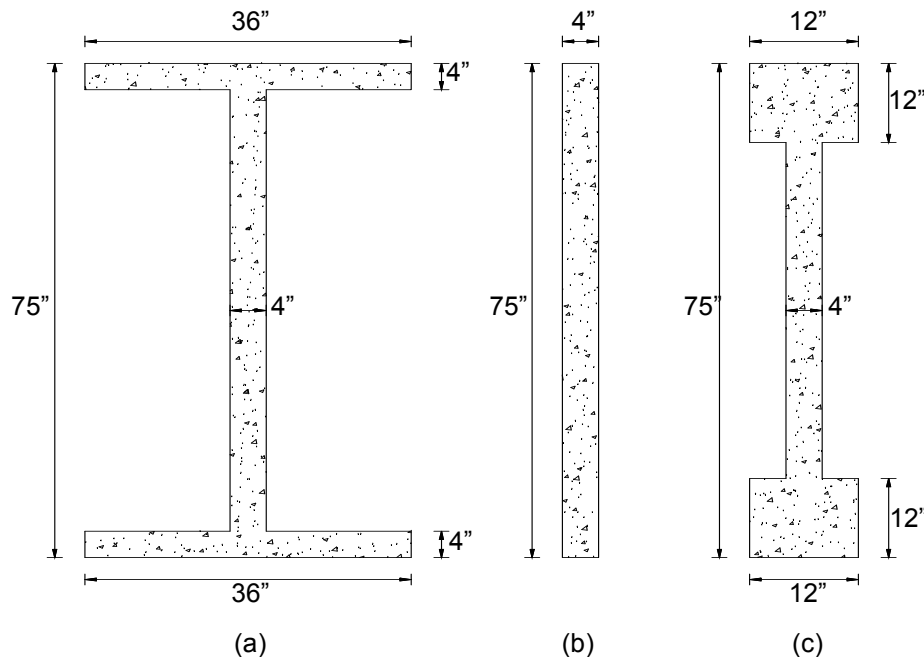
Nominal cross-sectional dimensions of test specimens (1 in. = 25.4 mm).
